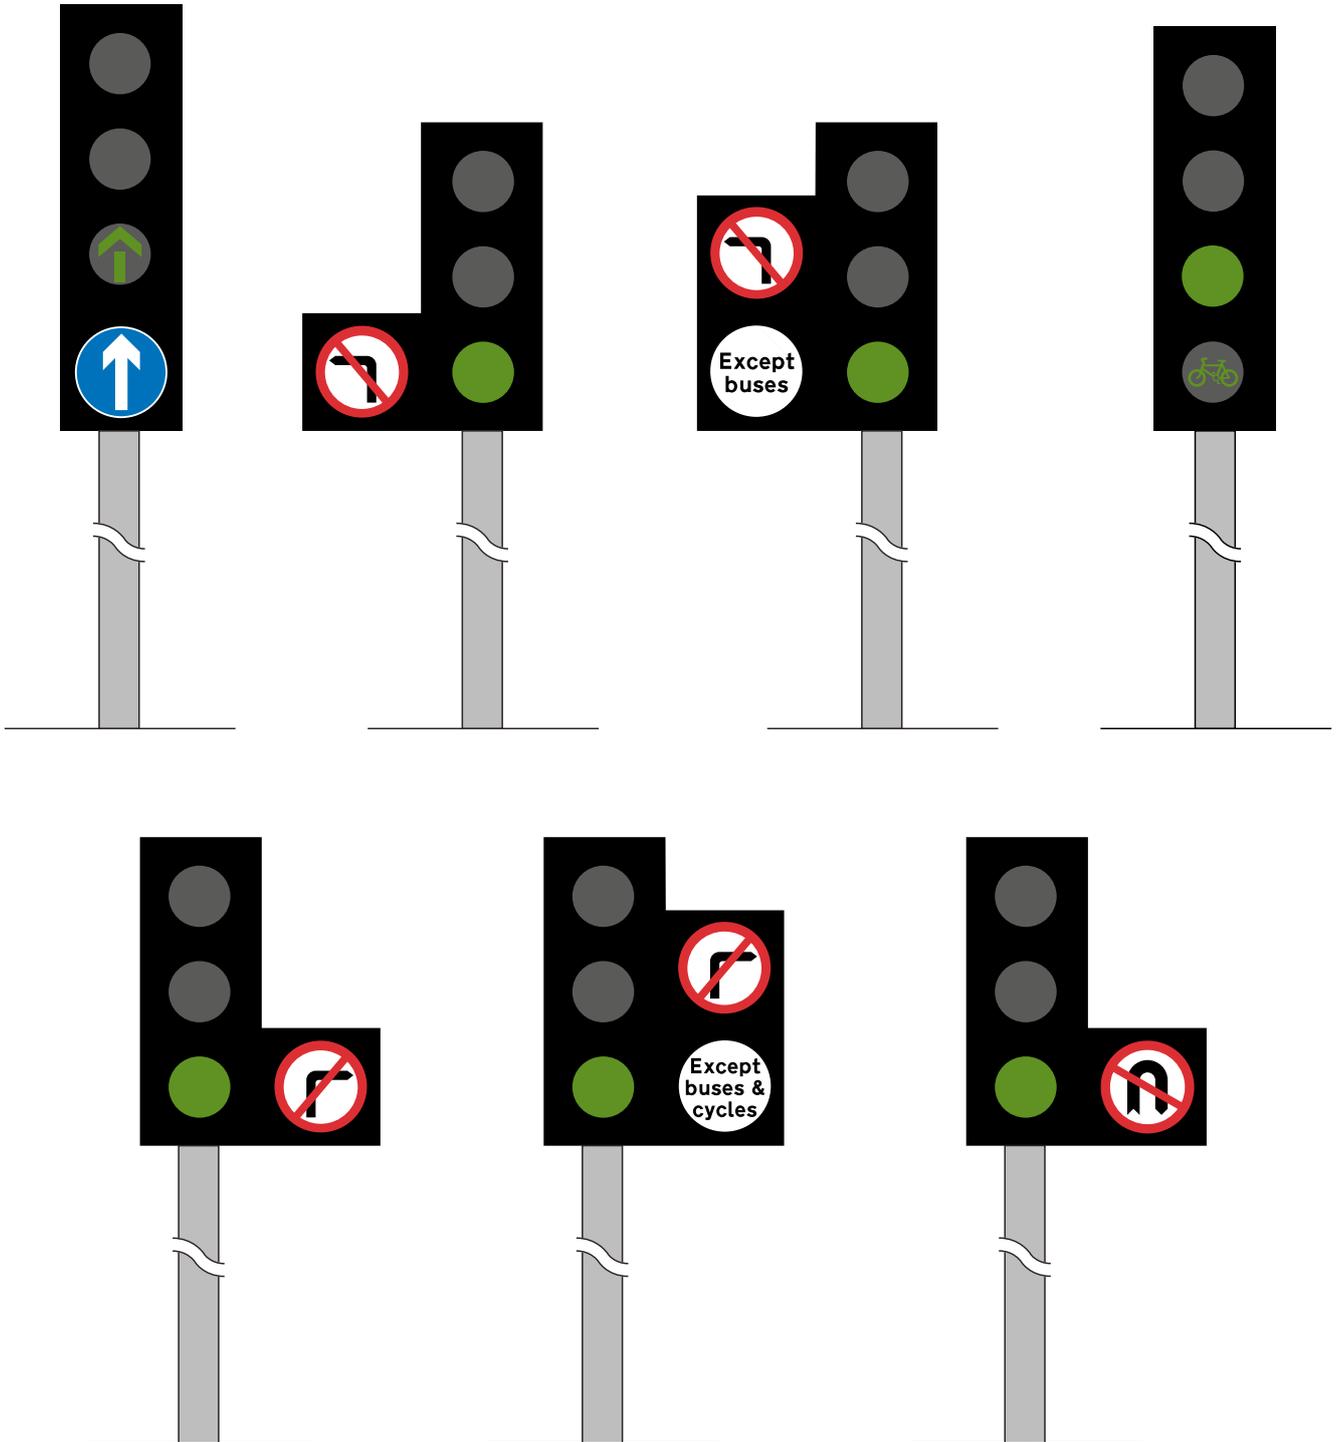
Alternative signal head layouts showing common regulatory box sign arrangements and exception plates
